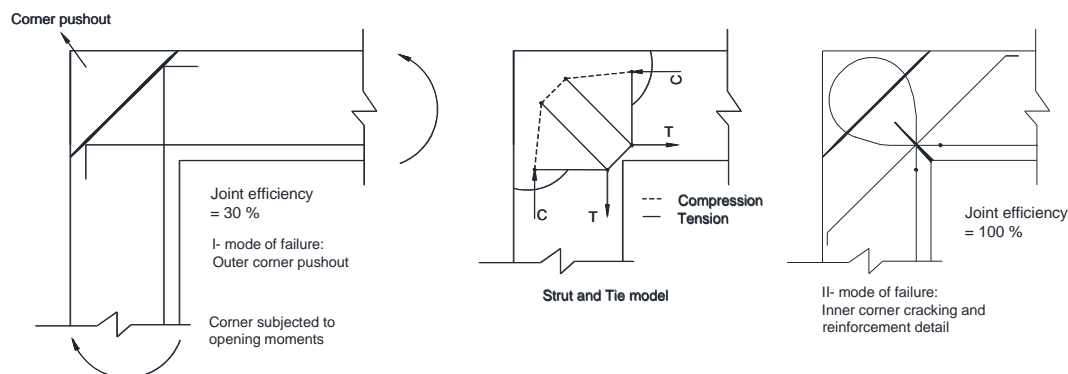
Corner cracking, STM and reinforcement detail
